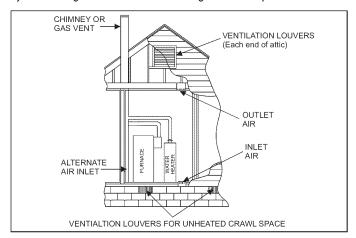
Alternate Air Intake, Air Outlet and Chimney Connections
